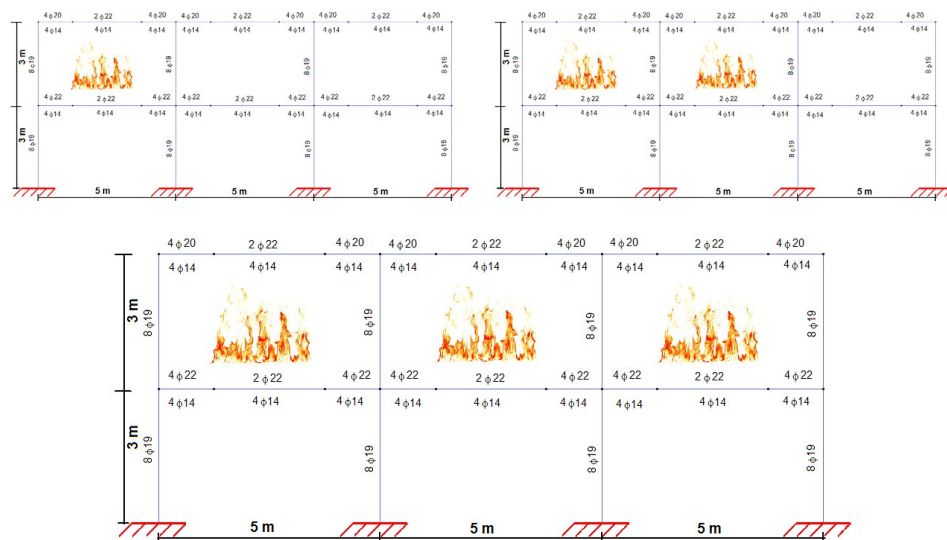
Fire scenarios and reinforcement in the structural elements of the RC frame
